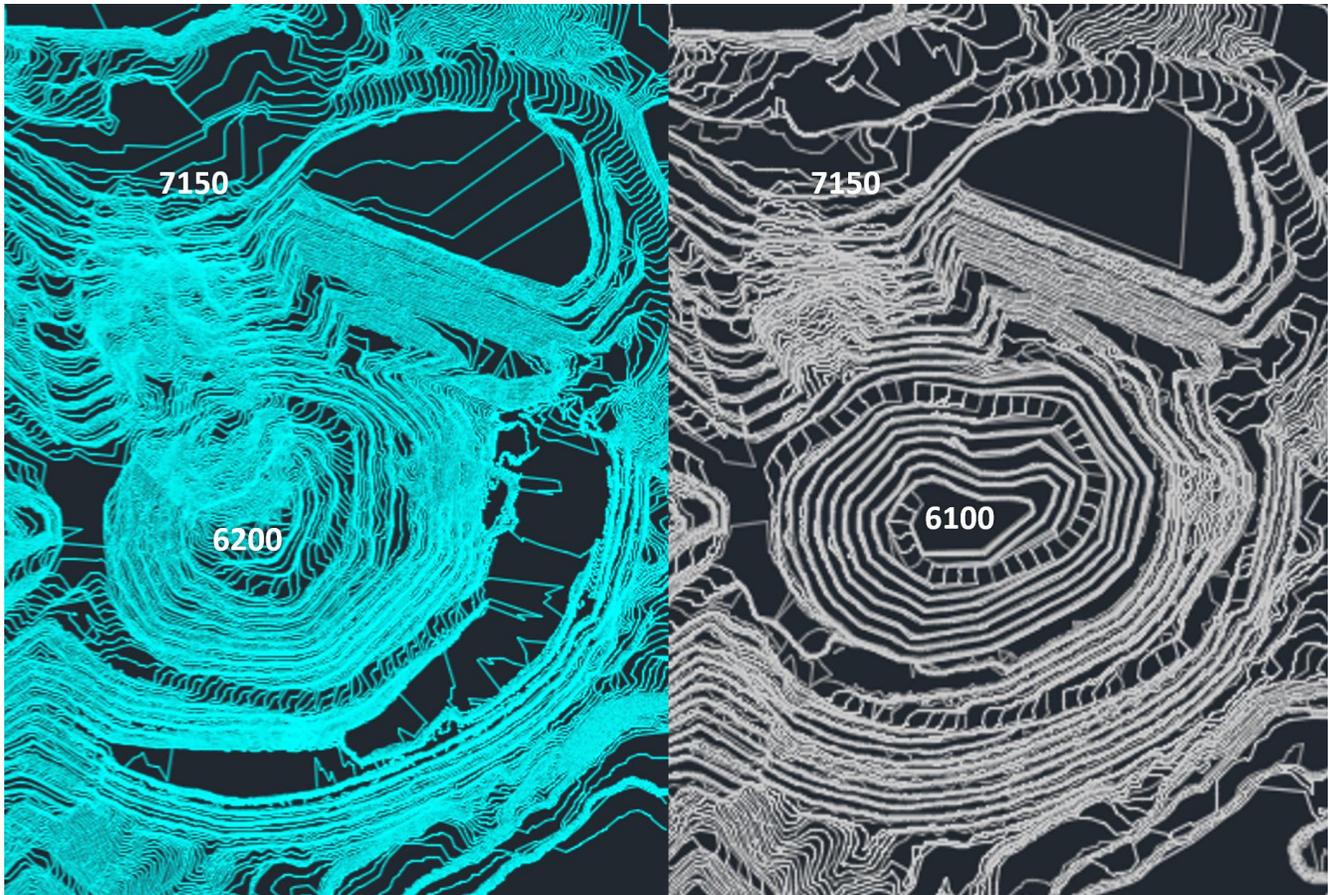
2018 geometry of the pit (left) and the proposed mine plan (right).
